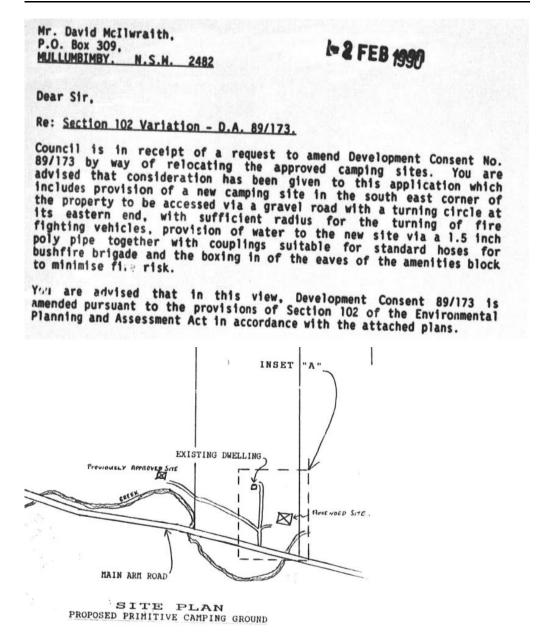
Site plan for DA 5.1989.173.1 – Primitive Camping Ground
